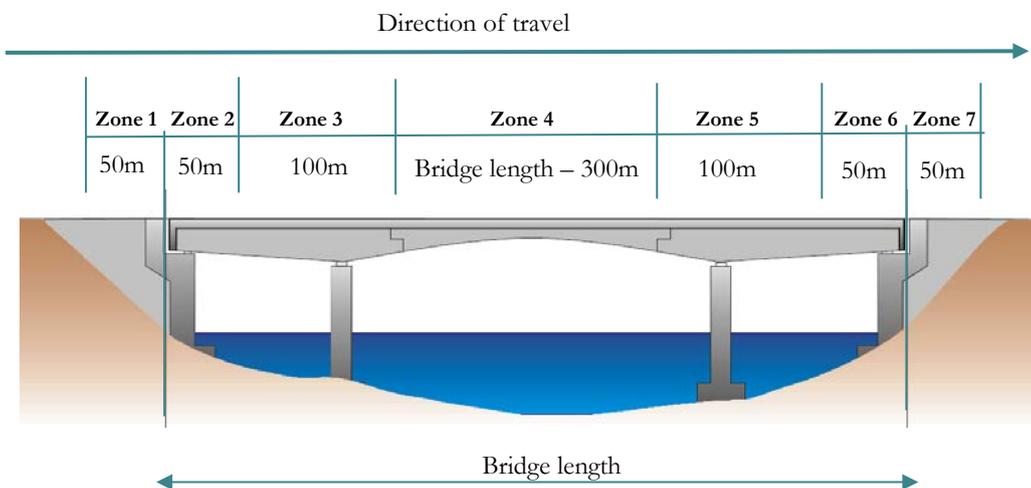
Bridge zones. Example shows zones for bridges longer than 300 m. (Adapted from Ranes, 1999).
